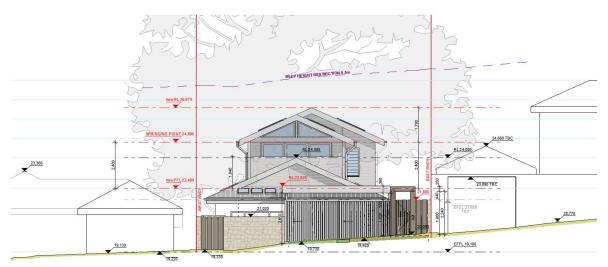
Building Height Analysis South (Street) Elevation – Extract of DA-110.
